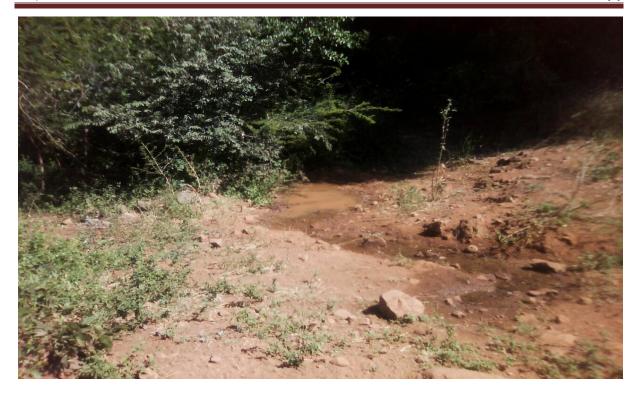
Leakage due to cracks on the siphon pipes downstream of the Nzhelele weir
